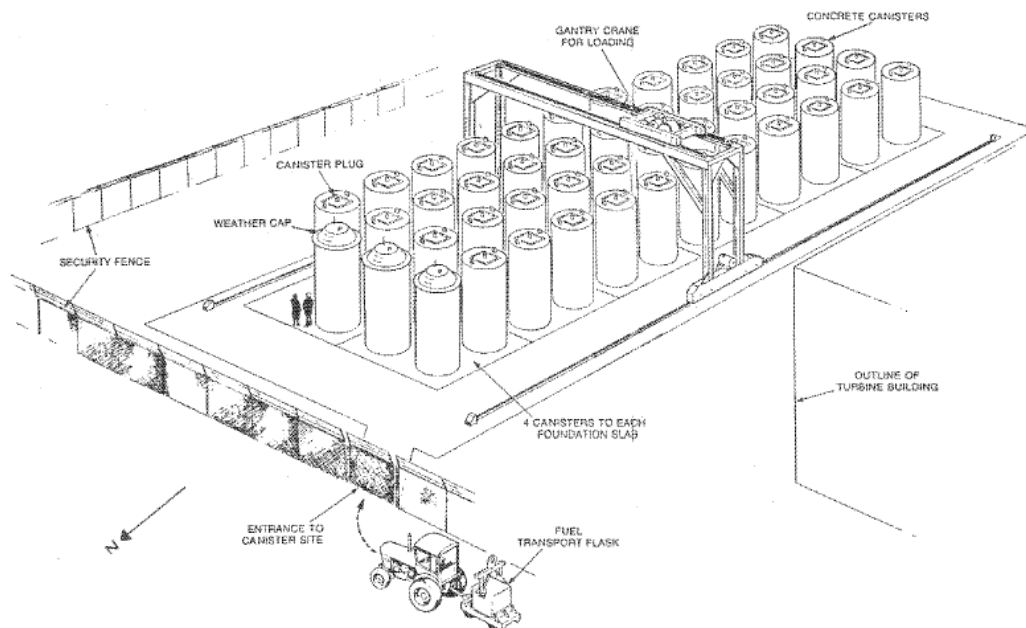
Point Lepreau Used Fuel Dry Storage Area
